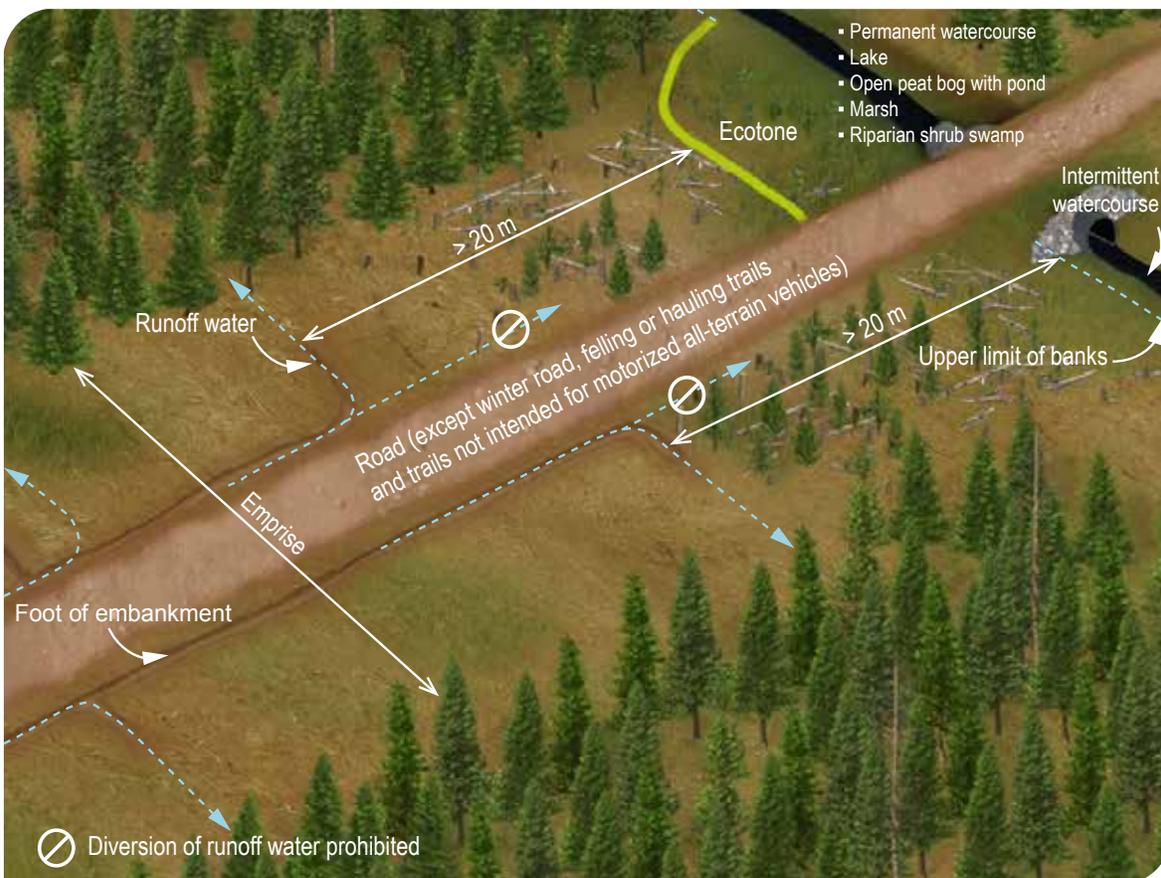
A Diversion of water flowing at the foot of the embankment of a road
